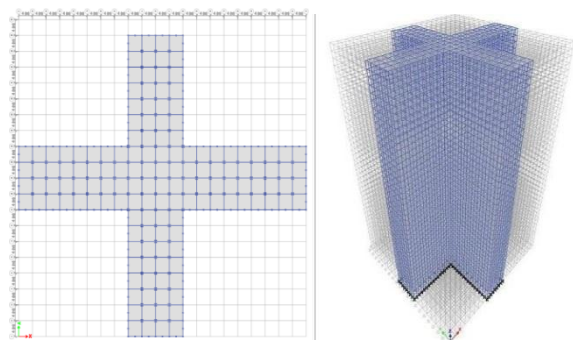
Plan view and 3-Dimensional view of Plus-Shape model
